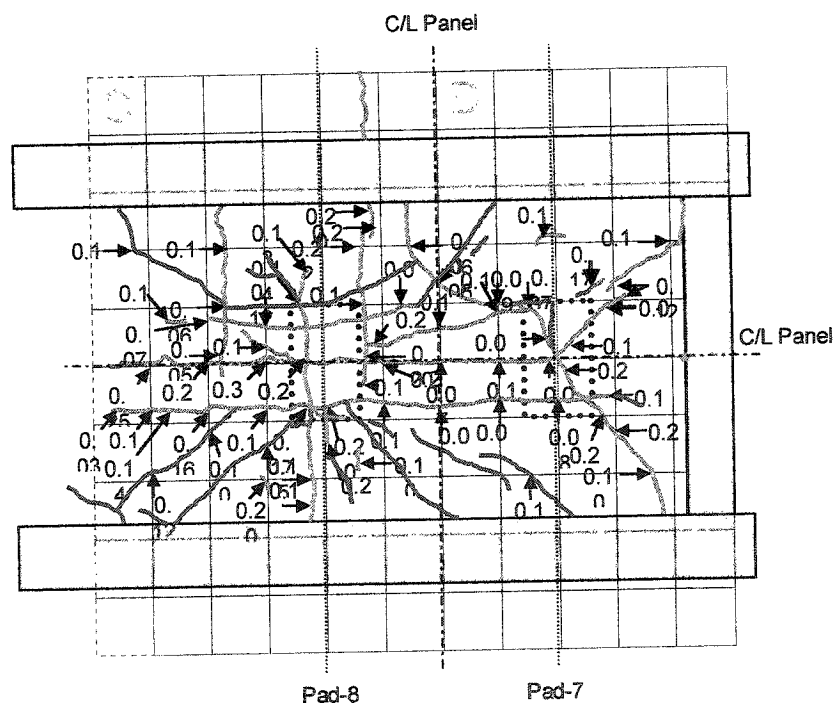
Panel-D: Crack Pattern on Soffit after 500 Load Cycles at 883 kN
